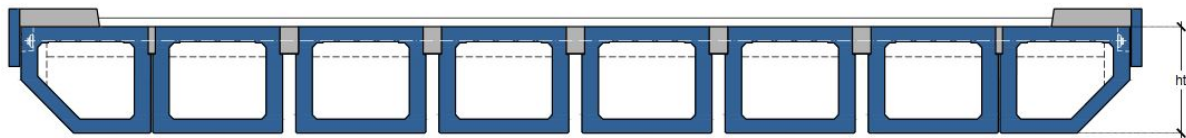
A box beam construction with small construction height (ht). Source: Spanbeton
